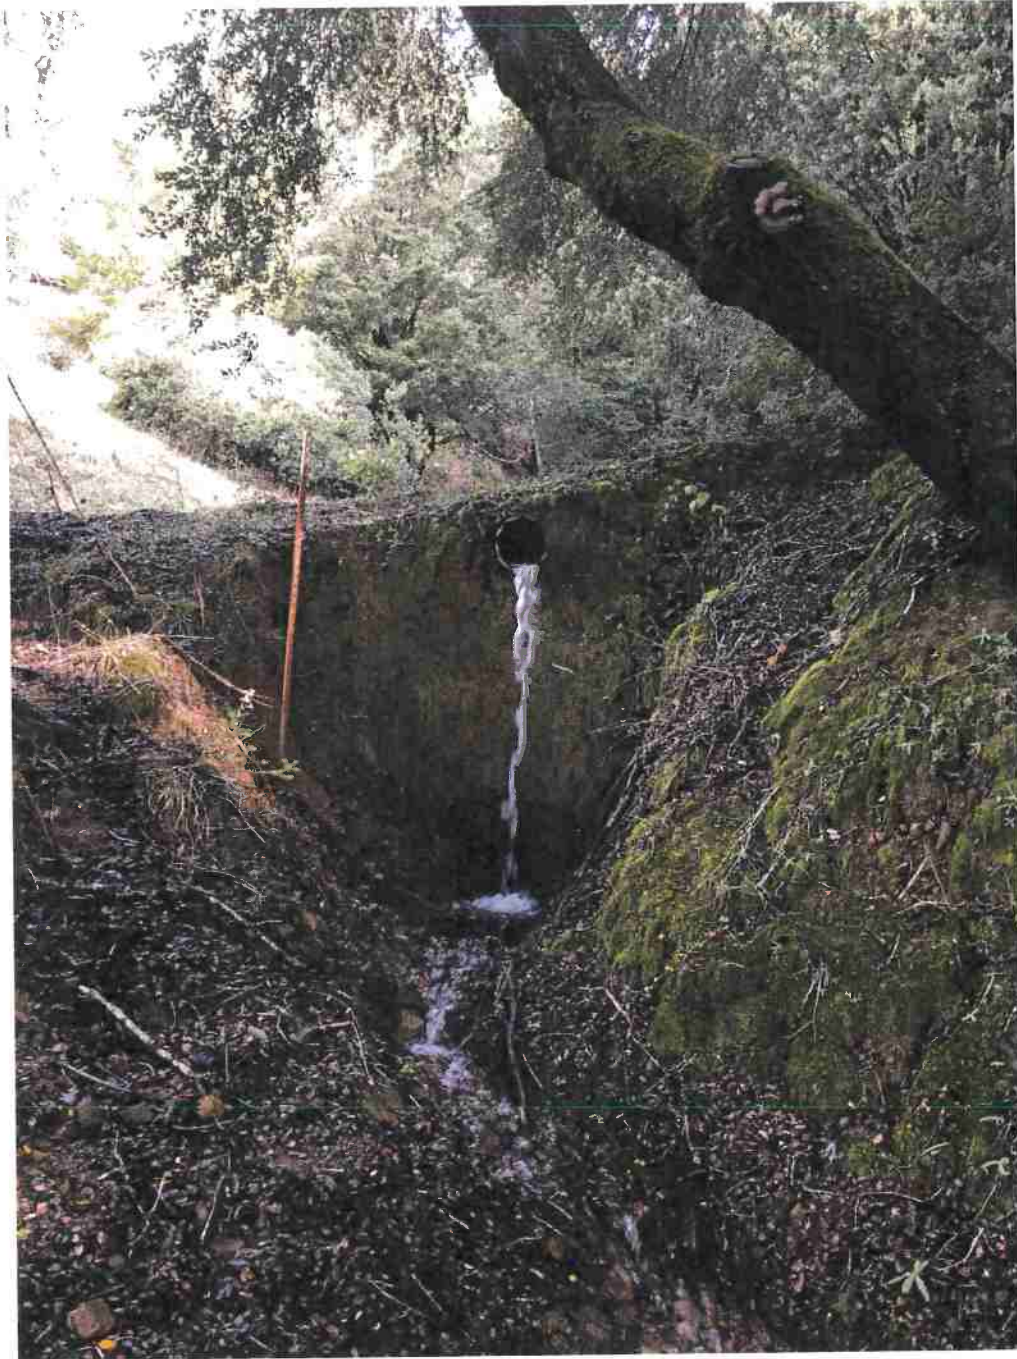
Outlet of Crossing #1. The Applicant shall rock armor the outlet from the small Douglas-fir tree down to the inside ditch. Photo date 12-2-2016.
